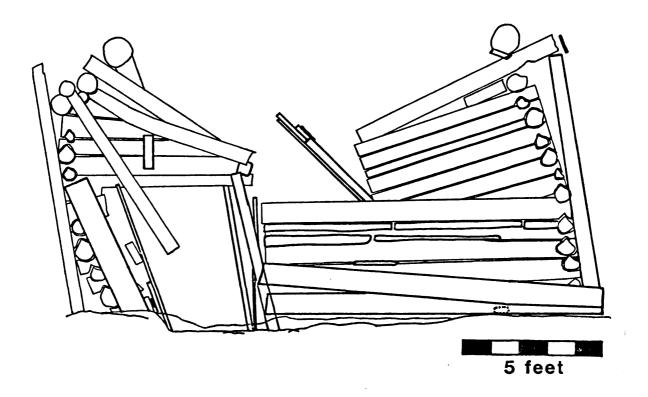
Elevation of the front (north) wall of Feature 23, illustrating the collapsed condition of the structure.
